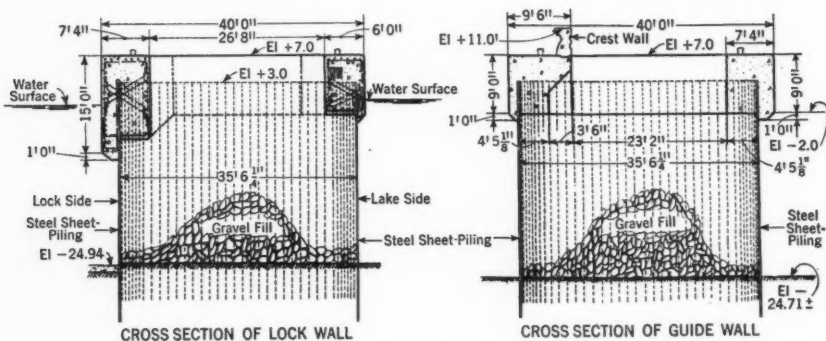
CROSS SECTIONS OF CELLULAR TYPE WALLS
